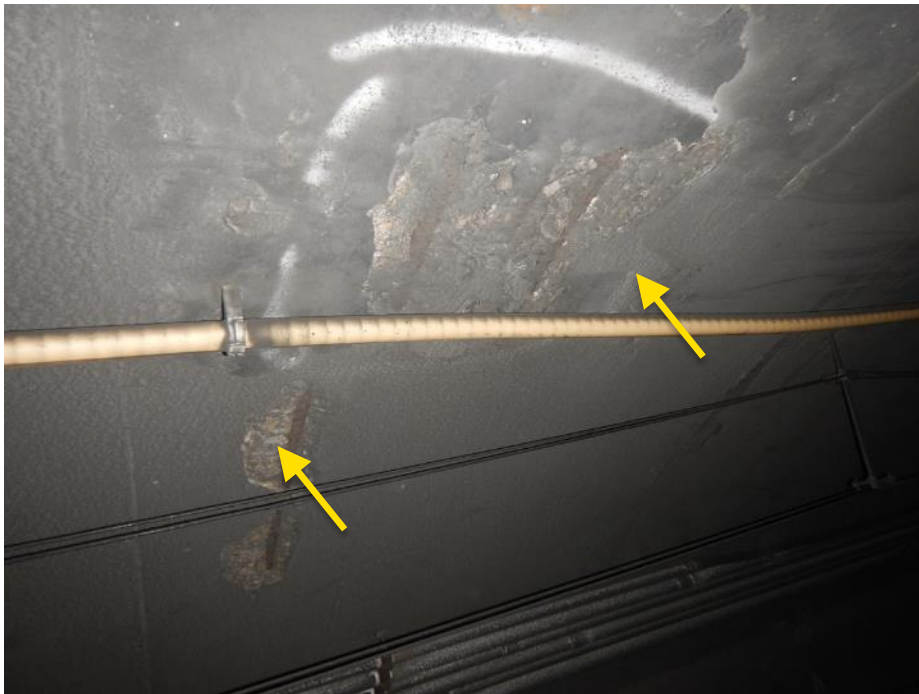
Exhaust Duct Liner at STA 470+98 - Spalling with Exposed Transverse Reinforcement (Little to No Section Loss of Steel Reinforcement, Looking East)
